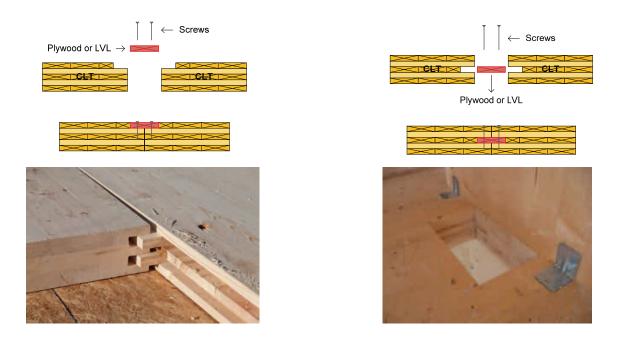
Examples of Types of Connections Typically Used to Establish Panel to Panel and Wall to Floor Connections in CLT Assemblies
